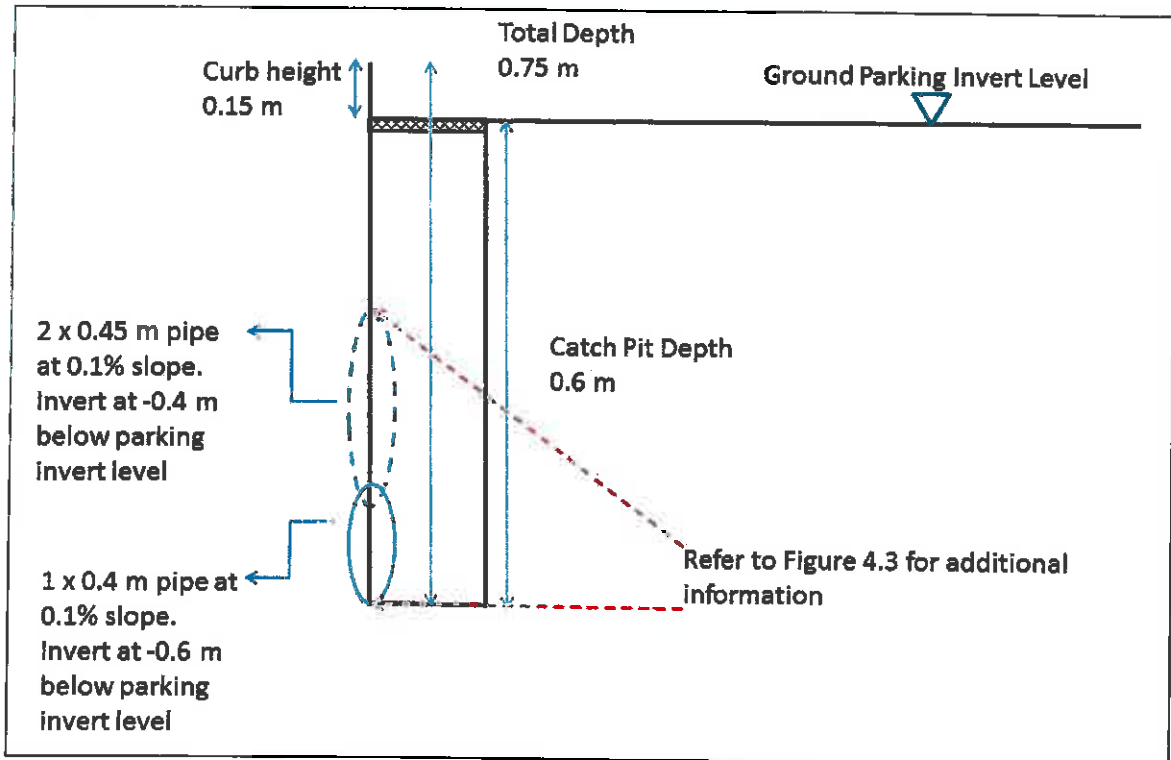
Conceptual Long Section Schematic of the Ground Level Catch Pit and the Stormwater Diversion Pipes.
